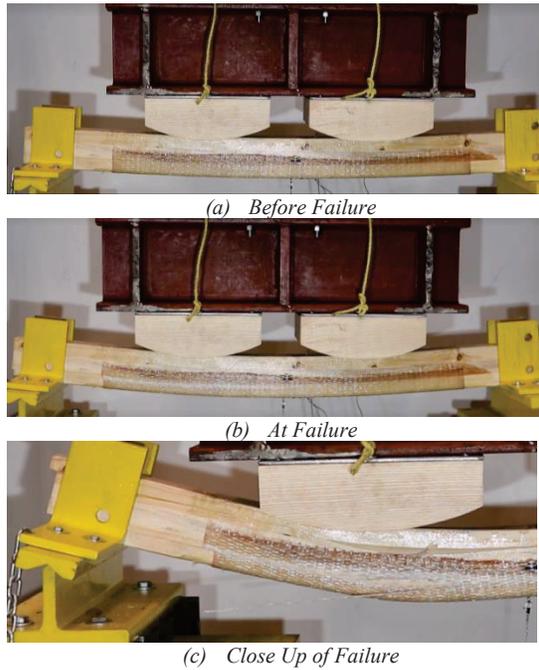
Representative Failure of Longitudinal Shear Dominated Failure Mode for U-Shaped Tension Reinforcement (GU4-1)
